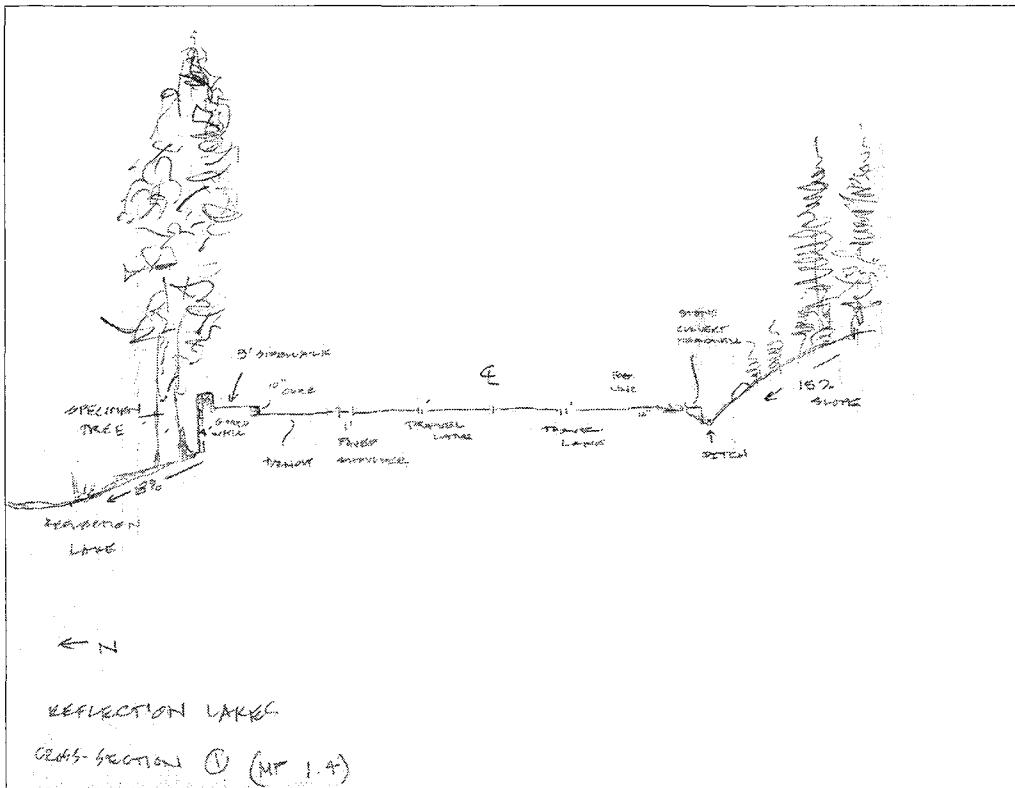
Contemporary sketch showing typical cross section at Reflection Lakes, with cut slope, inside ditch, road bed, sidewalk with curb, guardwall and retaining wall, and fill slope from right to left (MORA 2004).
